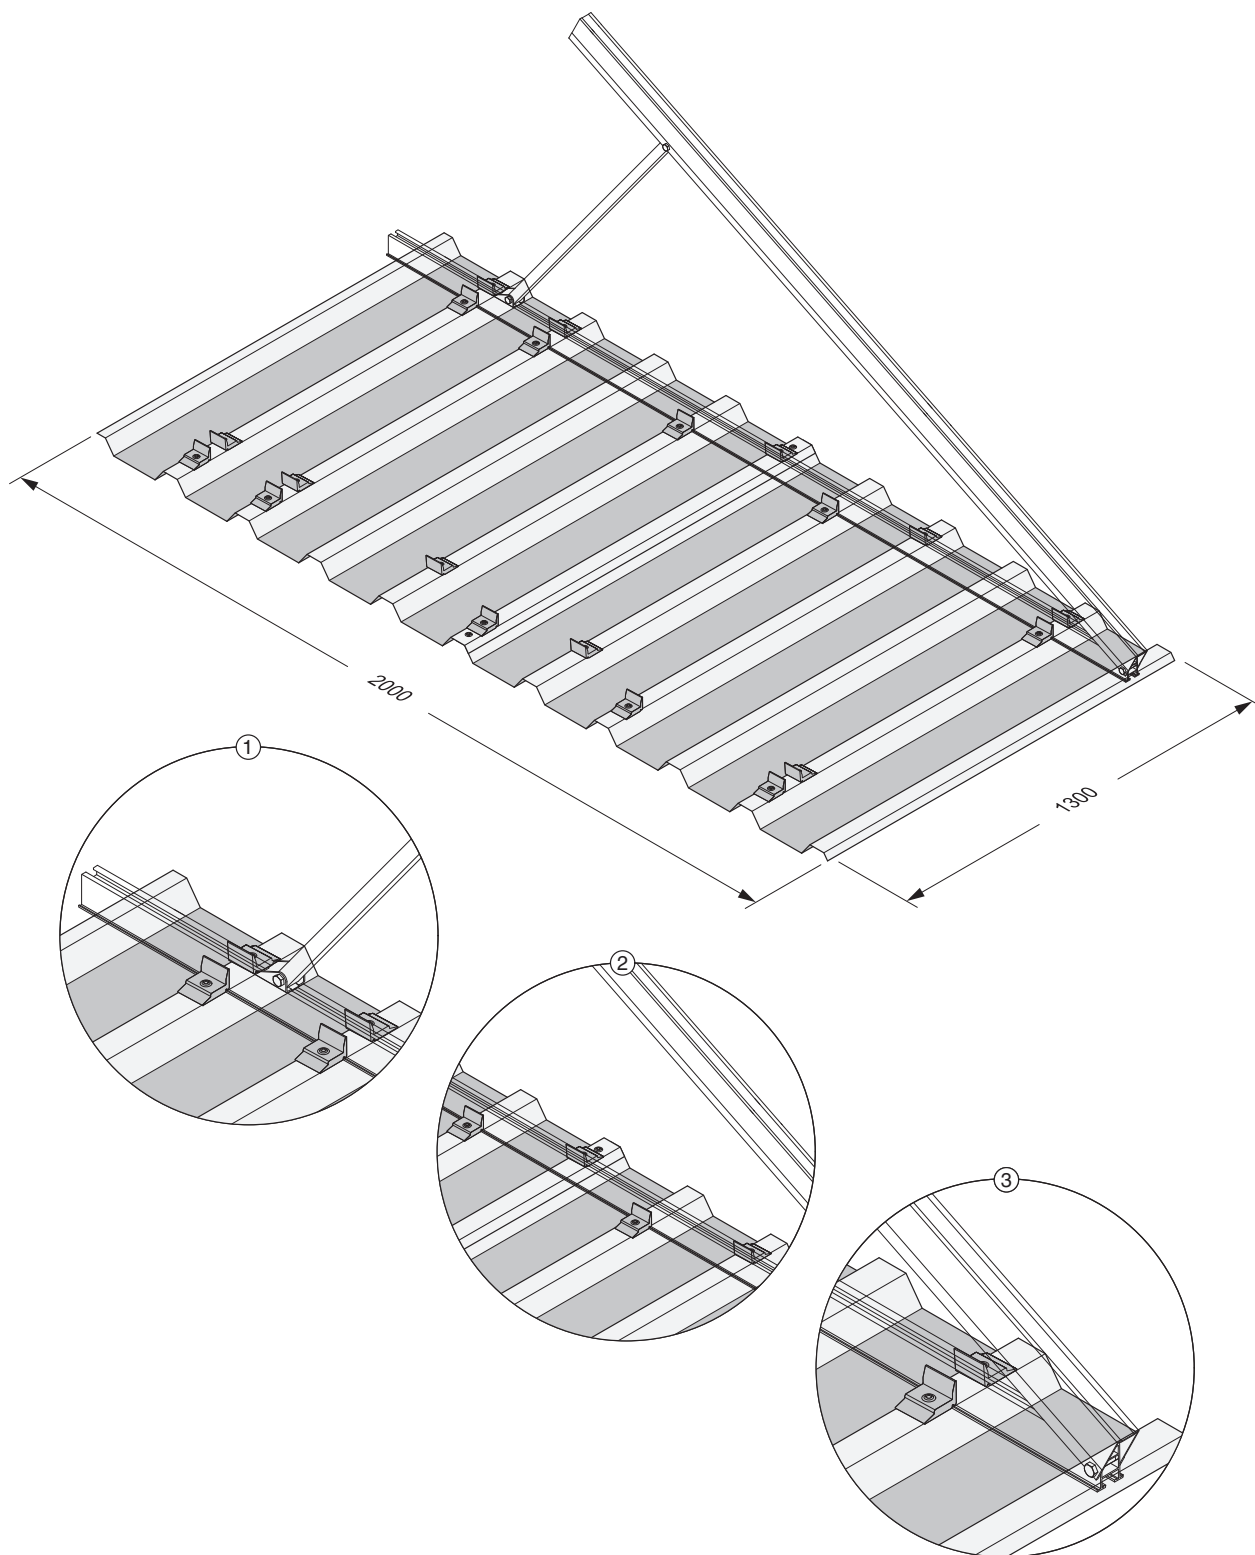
Gravel board basic set for vertical installation (prod. no. 192 020 75). At the supporting profile of the triangle use 4 clamping angles to encompass the ground rail on both sides (magnifying glass 1). At the front (magnifying glass 2) use one angle on each side.
